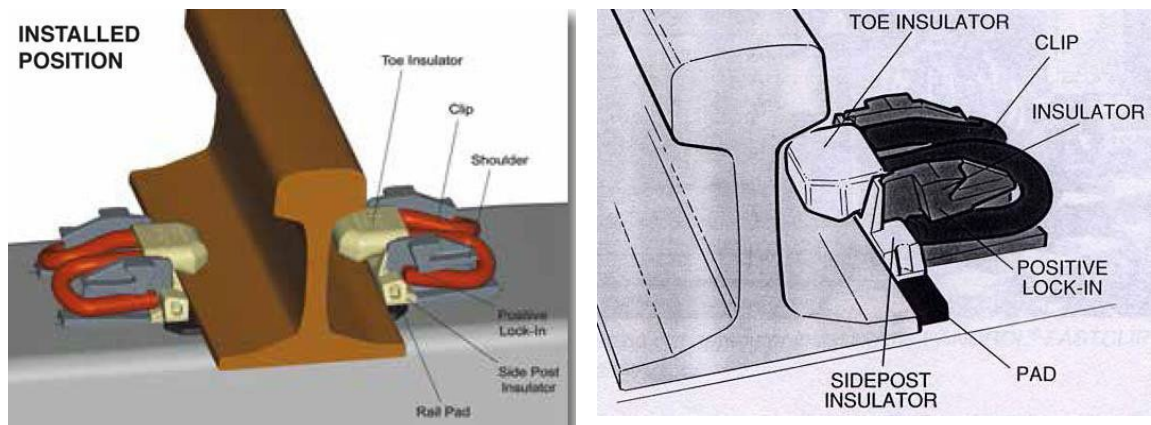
Elastic Fasteners: Fastclip on Concrete Tie
